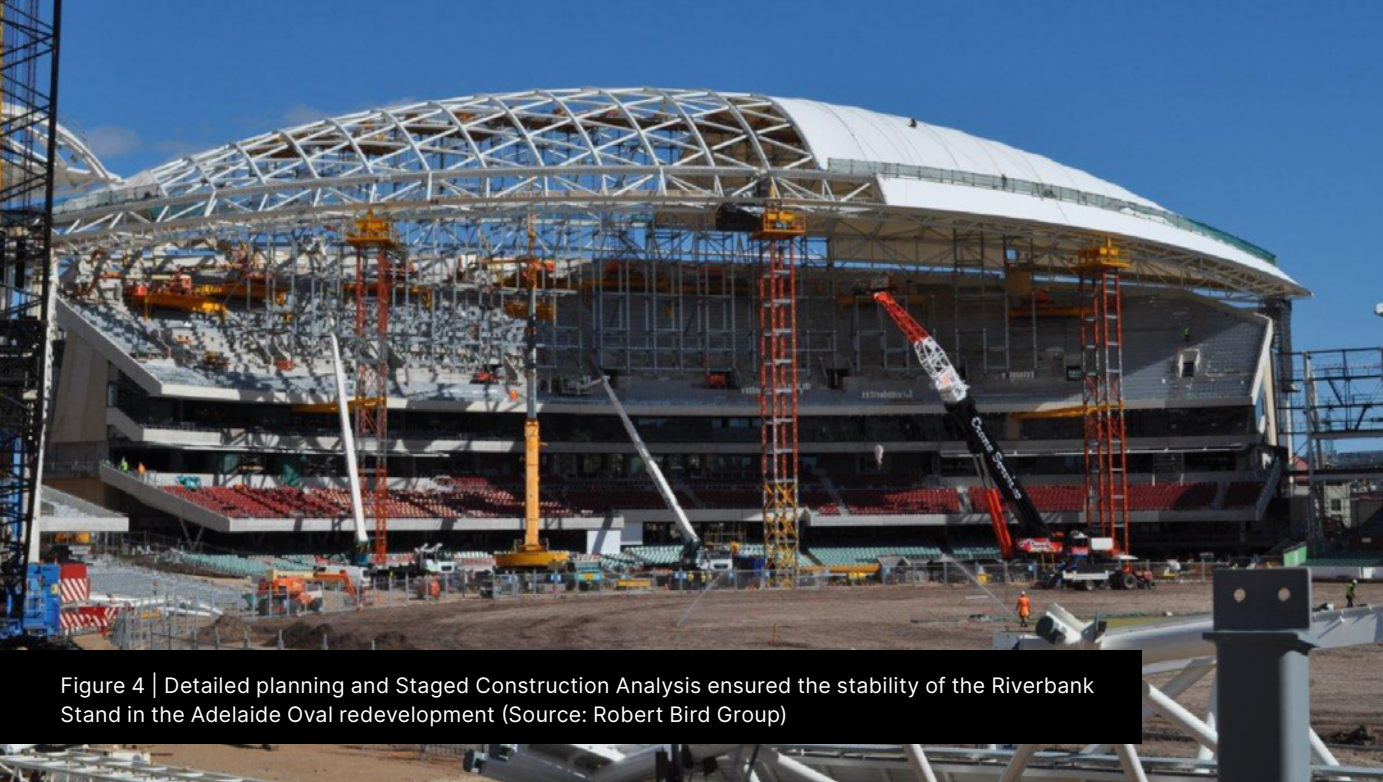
| Detailed planning and Staged Construction Analysis ensured the stability of the Riverbank Stand in the Adelaide Oval redevelopment (Source: Robert Bird Group)
